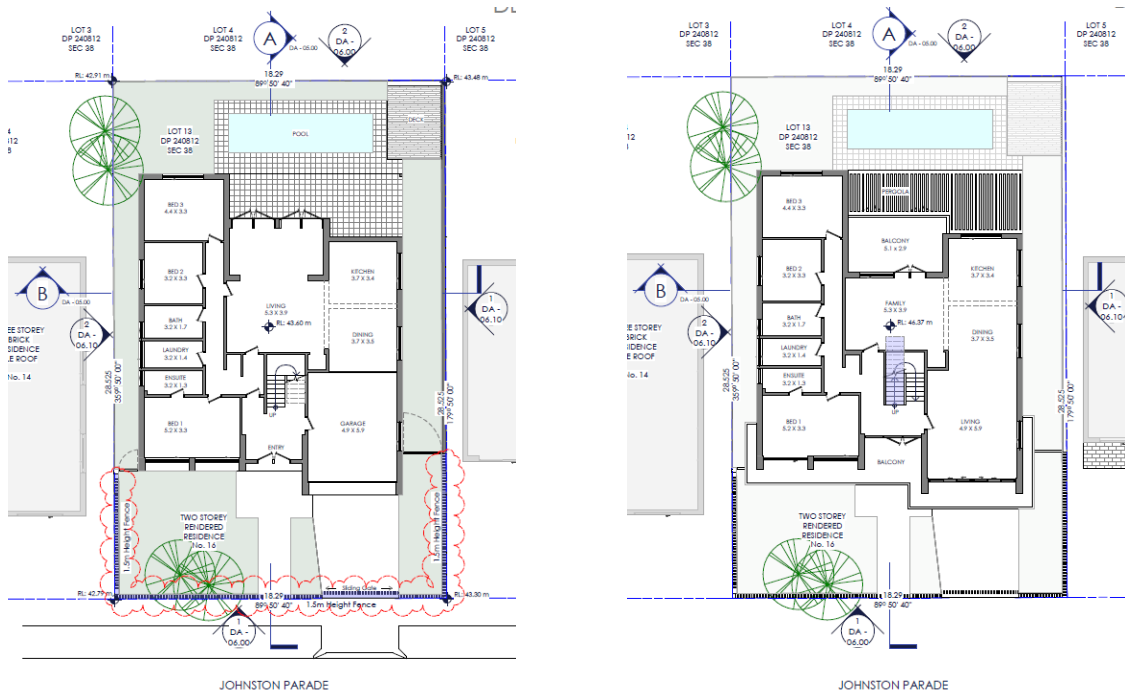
Floor plan submitted with original application - 16 Johnston Parade, Maroubra
